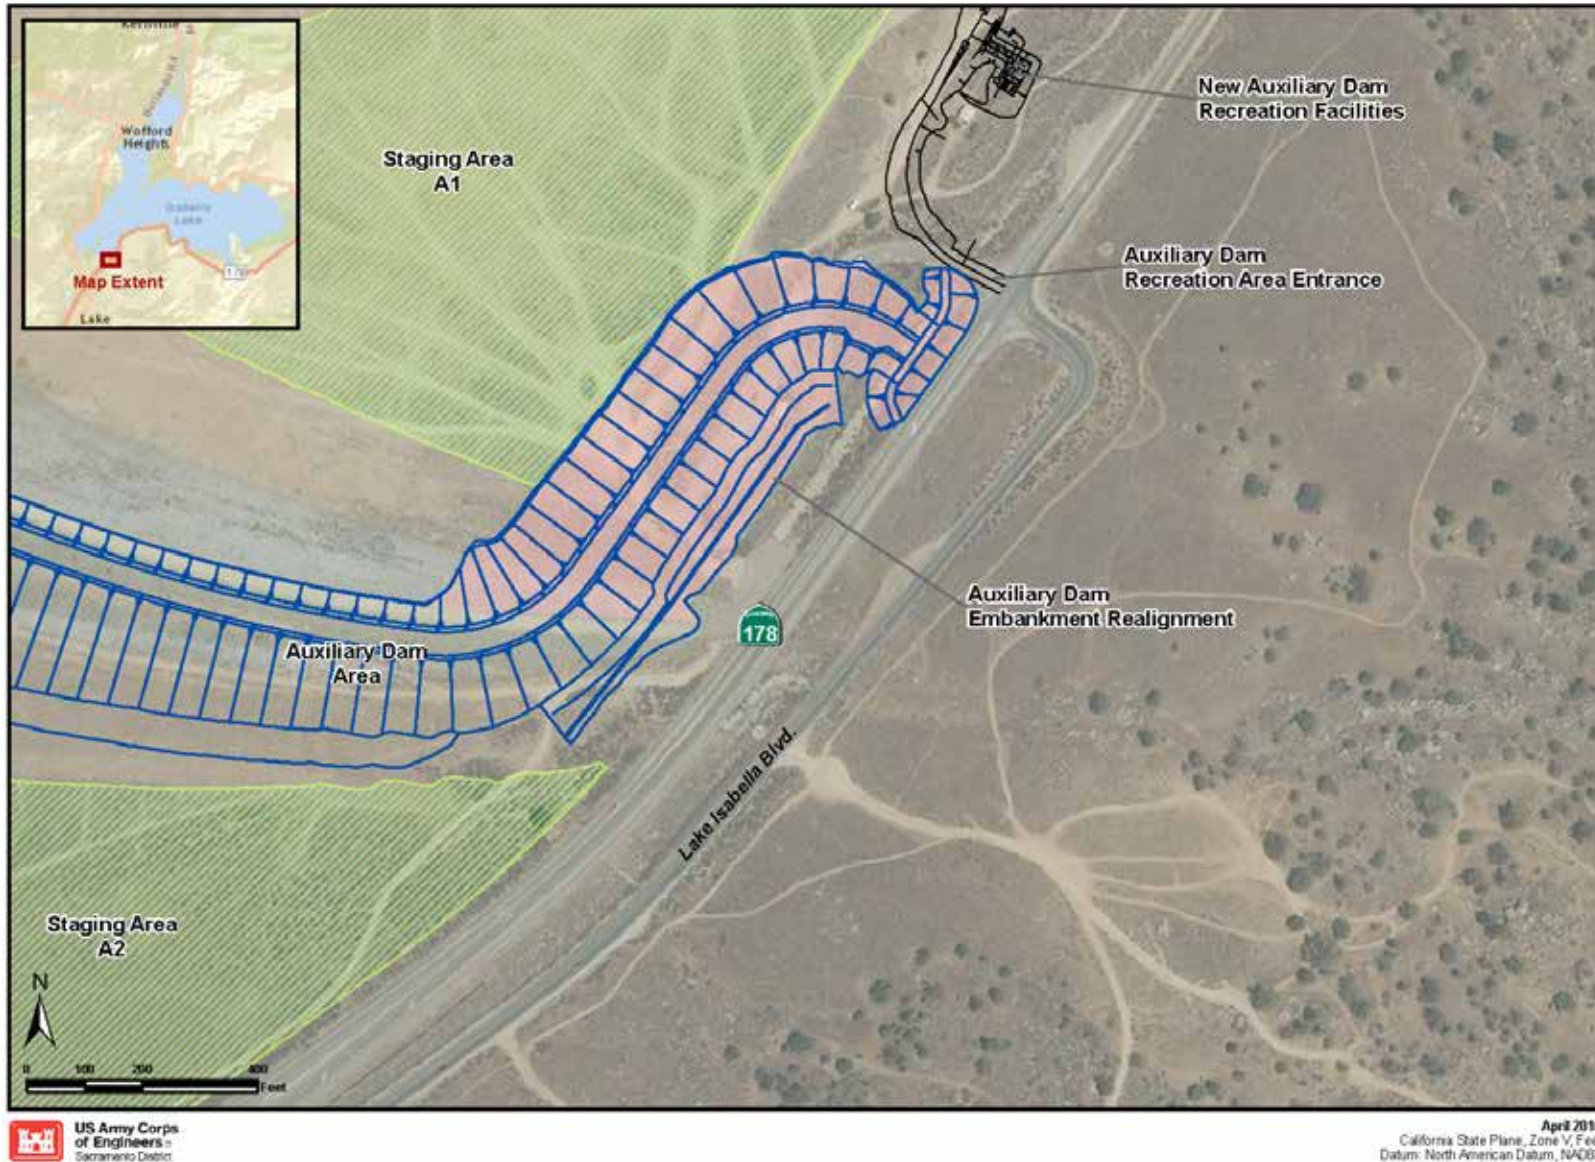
Auxiliary Dam Left Abutment Embankment Design Refinement.
